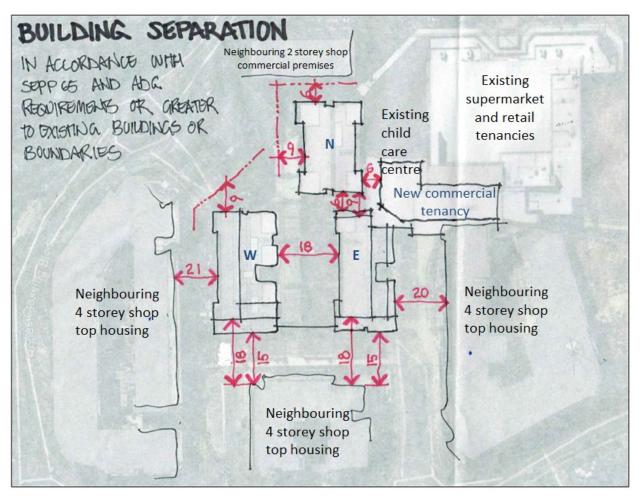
Extract from the applicant's Rational Diagrams Plan demonstrating that there is a distance of at least 12 m between the proposed apartments and the surrounding residential apartments, as required by the Apartment Design Guide.
